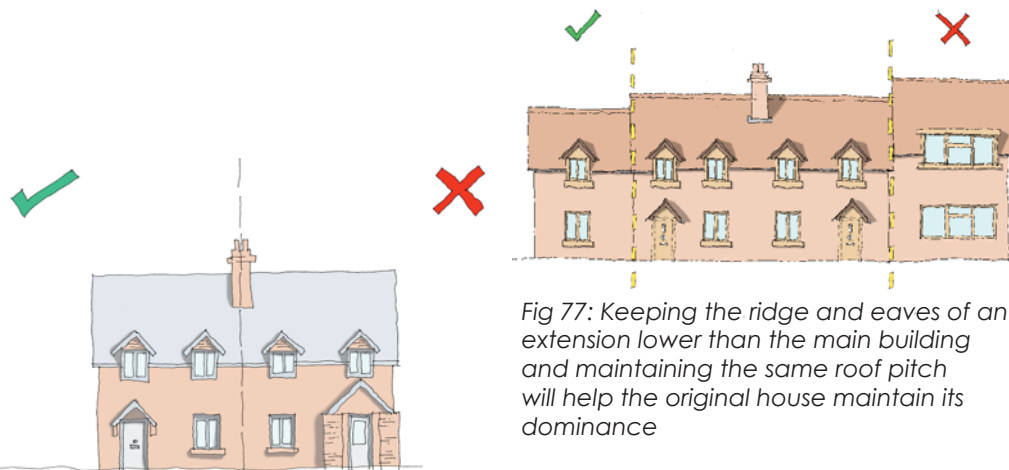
Keeping the ridge and eaves of an extension lower than the main building and maintaining the same roof pitch will help the original house maintain its dominance
